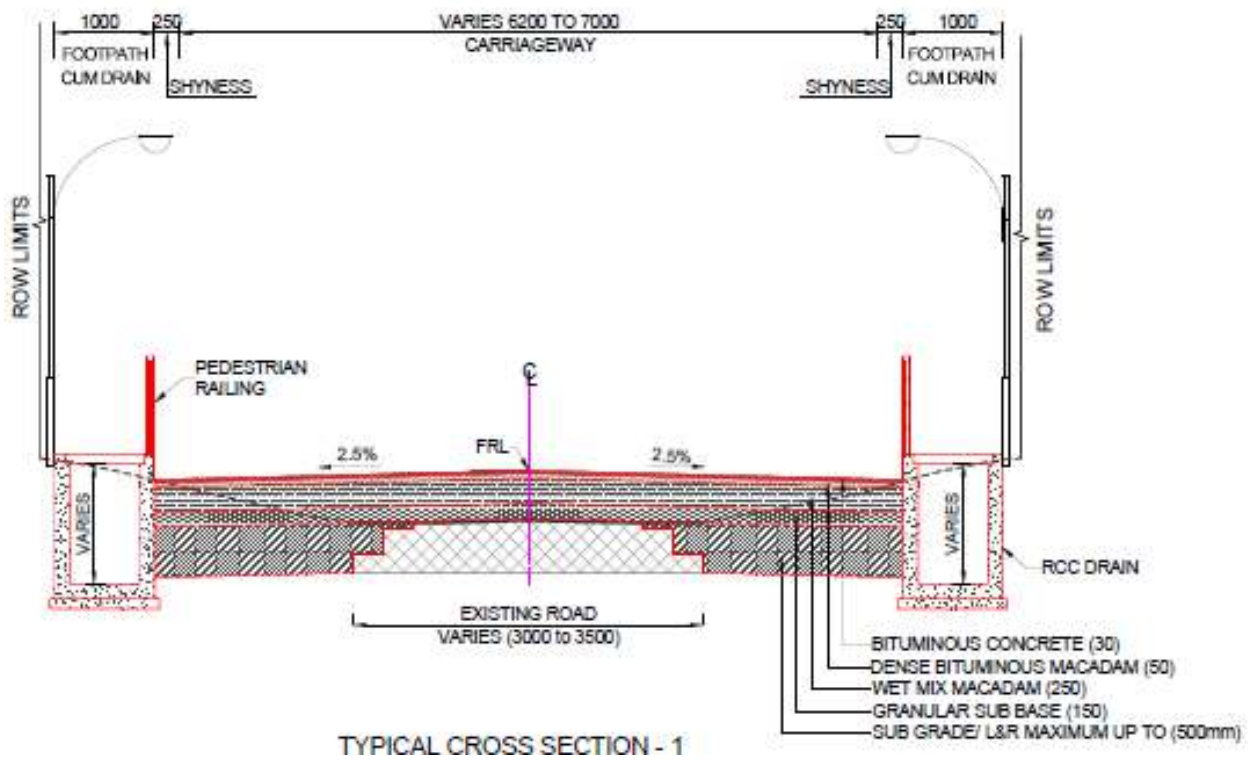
Typical Cross Section with Built-up Section (TCS-1)
